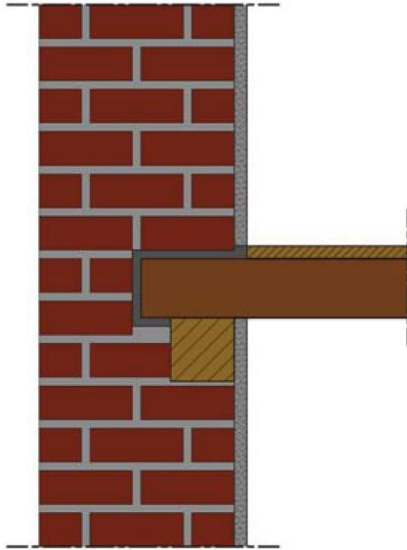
Danish construction used by [Harrestrup, M. 2016].
